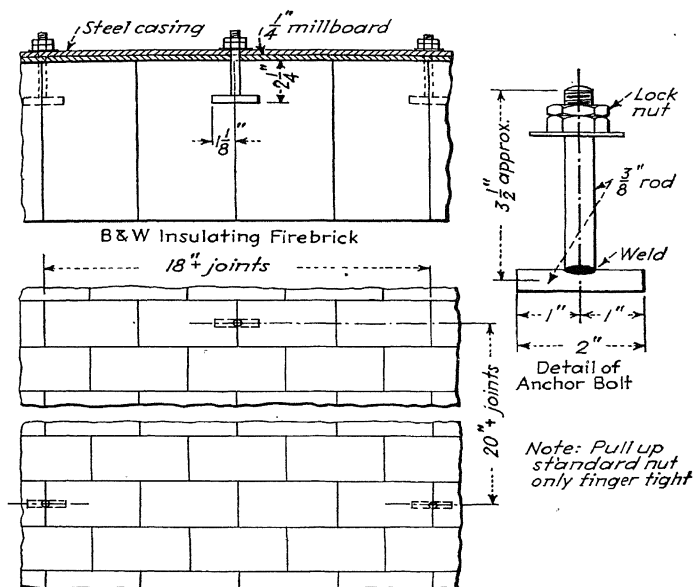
Method of holding insulating firebrick to casing. (Courtesy of Babcock & Wilcox Company.)
